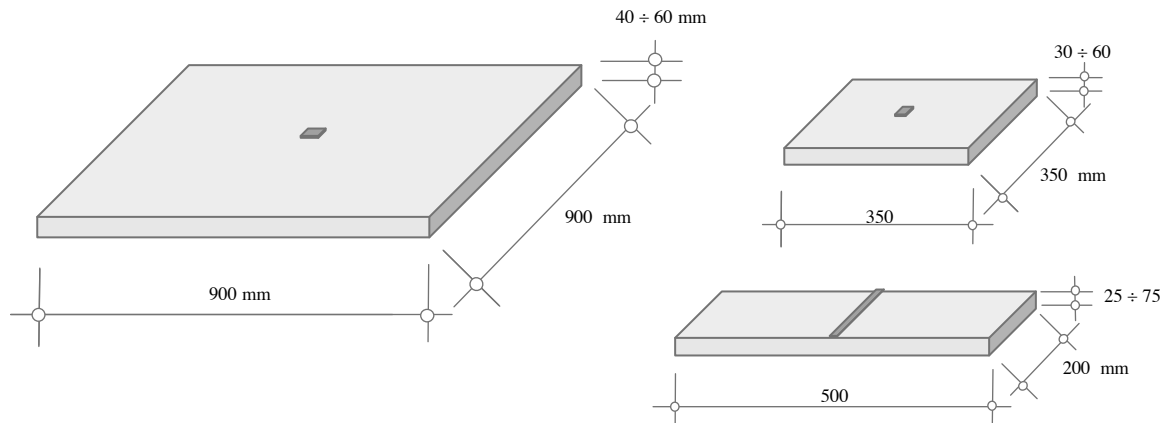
Geometry of tested specimens: a) slabs tested in bending failure under point load; b) slabs tested in punching shear failure; c) beams (plates) tested in three-point bending.
